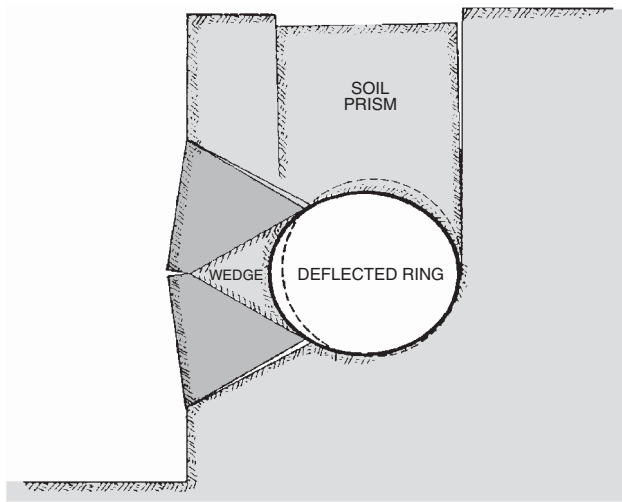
Formation of a soil prism on the pipe as a collapse mechanism forms.
